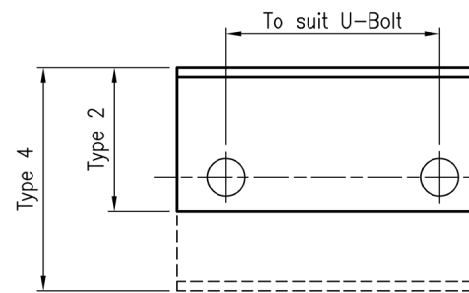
PLATE DETAIL (Shape to suit and hold sign extrusion firmly) TYPE 2 and 4
